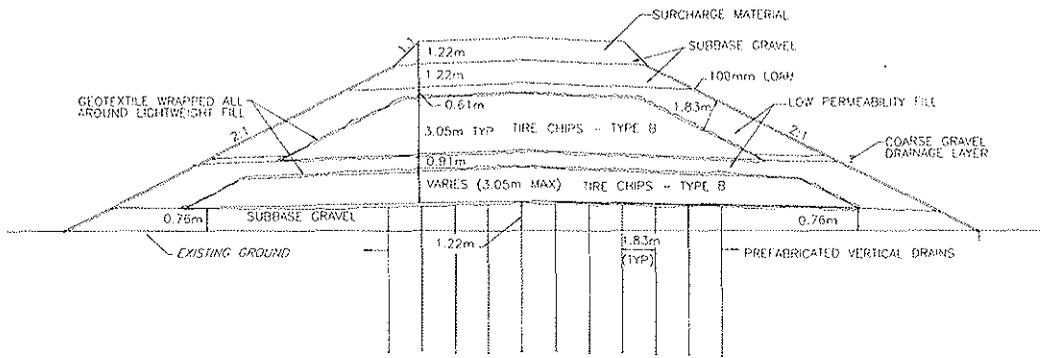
Cross section through embankment constructed on soft marine clay at the Portland (Maine) Jetport (Humphrey, et al., 1998)
